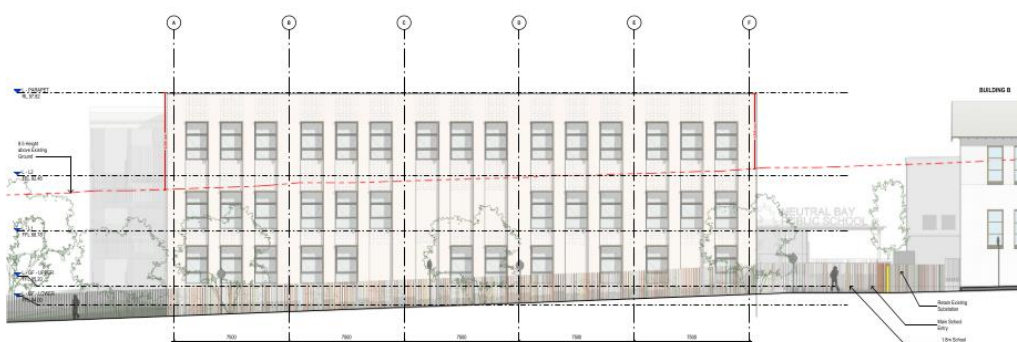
Proposed Eastern Elevation of Building L (Bydown Street)
